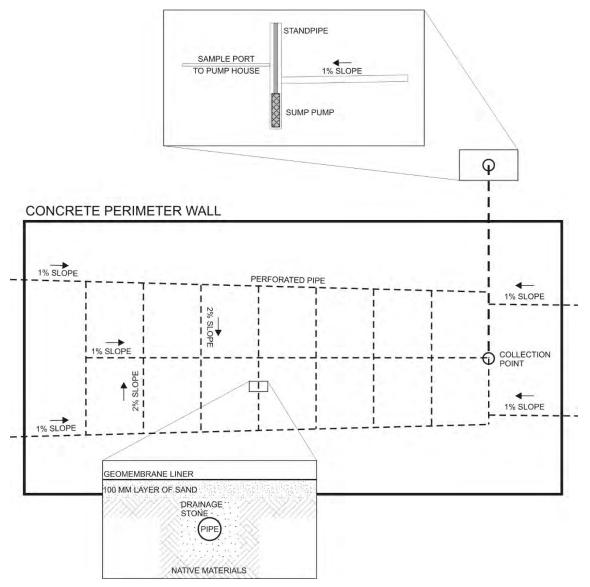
Plan-view and cross-sections showing the general layout of the groundwater collection system that will be installed below the low-rate anaerobic digester proposed for the Lake Utopia Paper Mill in Utopia, New Brunswick.
